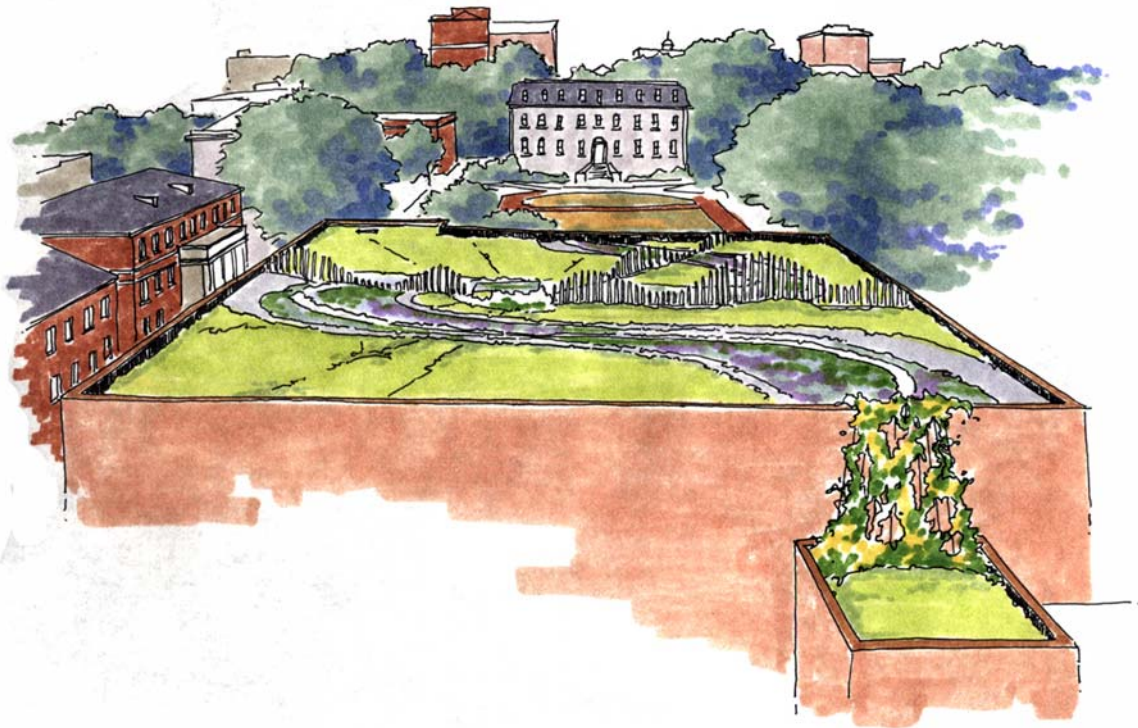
Extensive green roof design, 6th floor perspective view (from Caldwell Hall).
